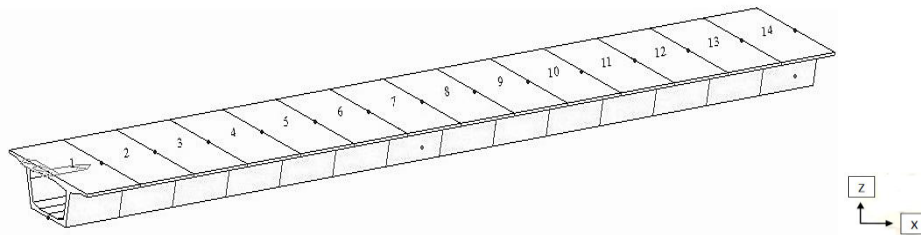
Typical 3D view of 70m continuous single-cell PSC Box Girder Bridge deck
